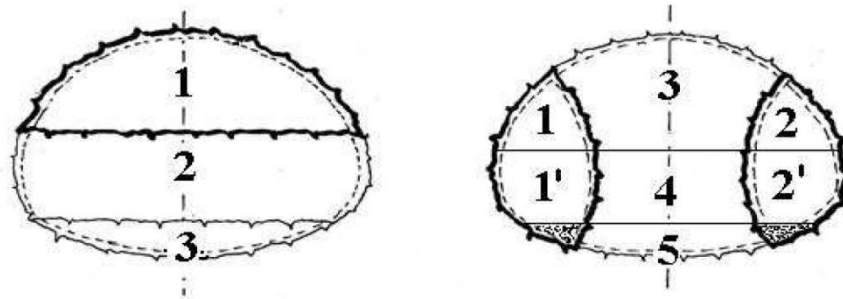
Tunnel face subdivision (after Barták 2009/10)
